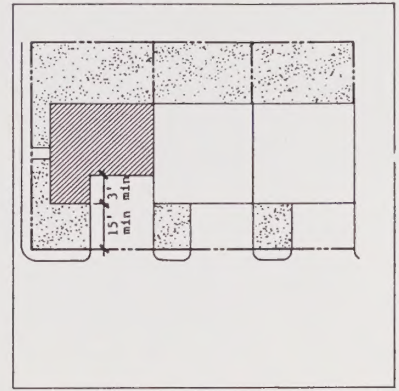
B.2-3. Recessed garage and second-floor living space over garage.
